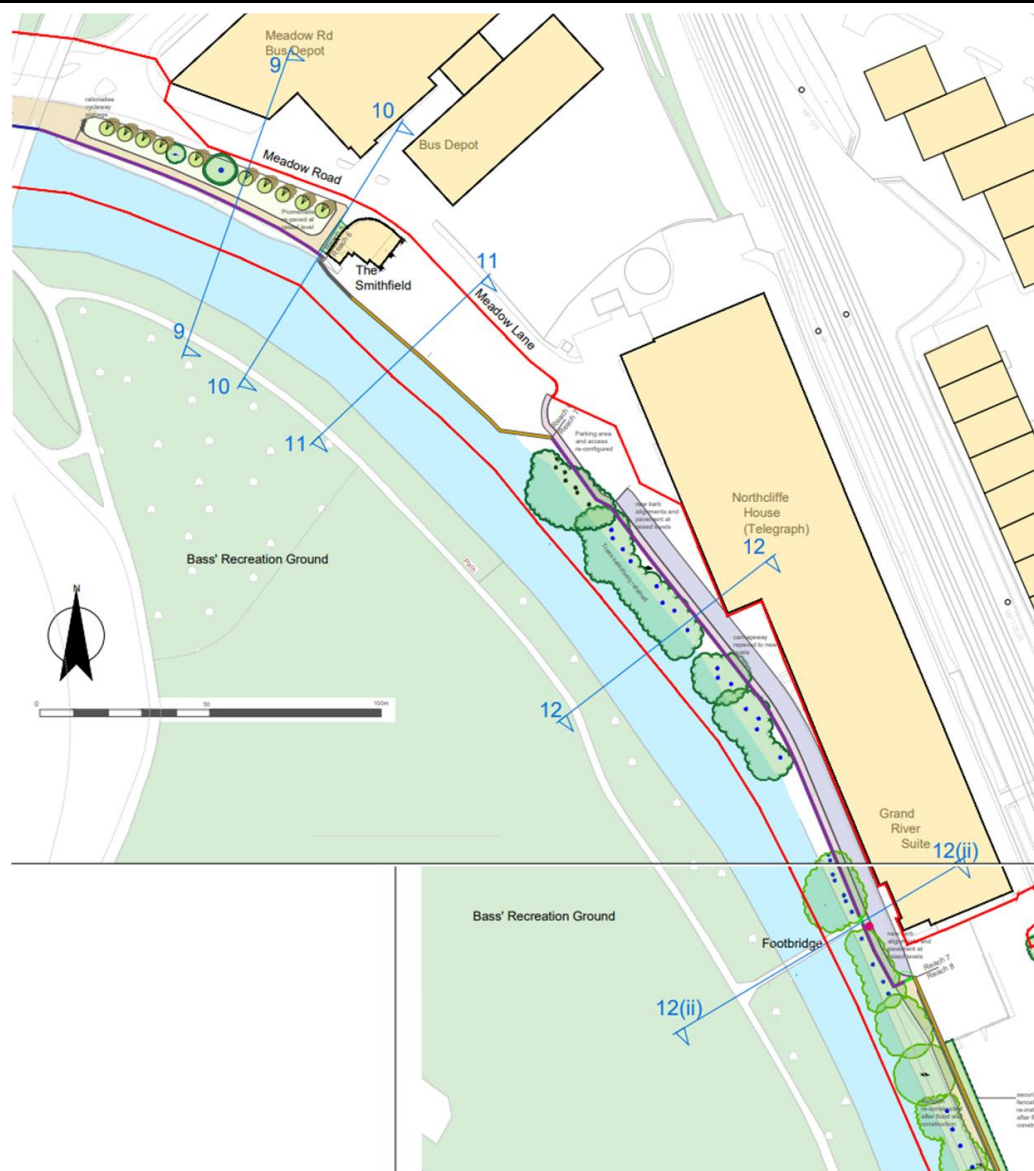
Proposed Flood Gate and Traffic Management proposals between Holmes Bridge and the Old Telegraph Building
